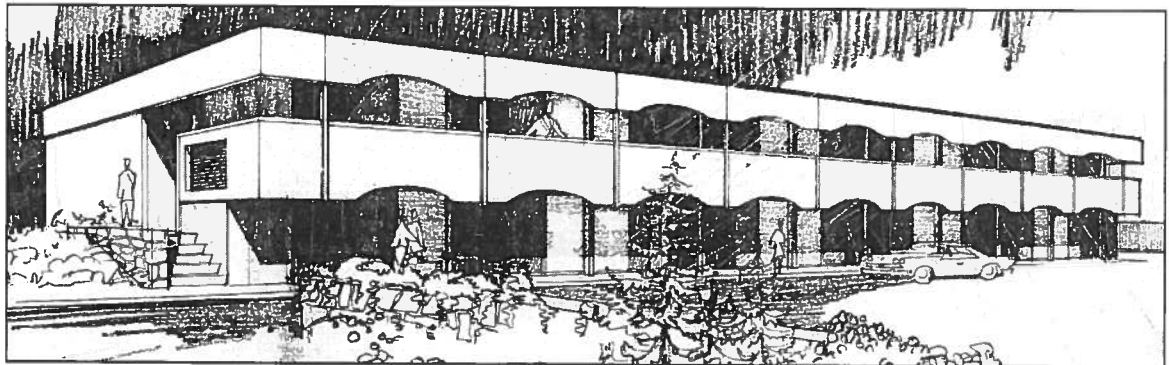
636 Clyde Avenue, Building Permit Records, c.1968
